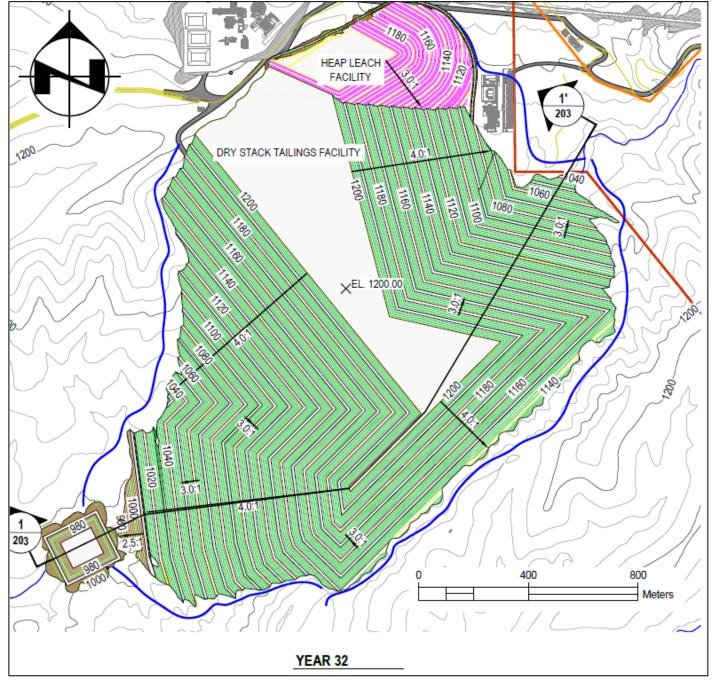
Dry Stack Tailings Facility Arrangement Year 32
